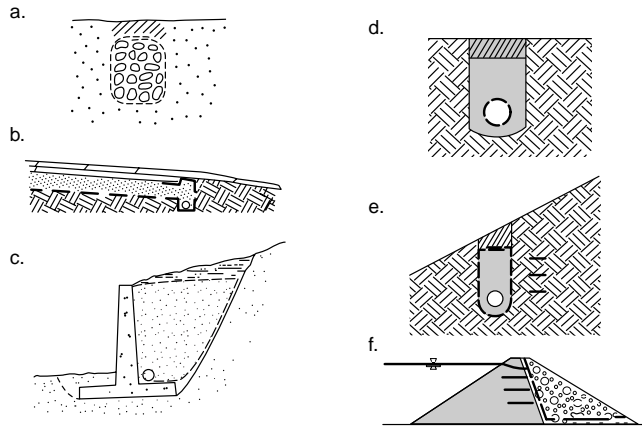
Drainage applications: (a) trench drains, (b) blanket and pavement edge drains, (c) structural drains, (d) pipe wraps, (e) interceptor drains, and (f) drains in dams. (Source: Christopher, B. R., and Holtz, R. D. 1989. *Geotextile Design and Construction Guidelines*. U.S. Federal Highway Administration, National Highway Institute, Report No. FHWA-HI-90-001.)
